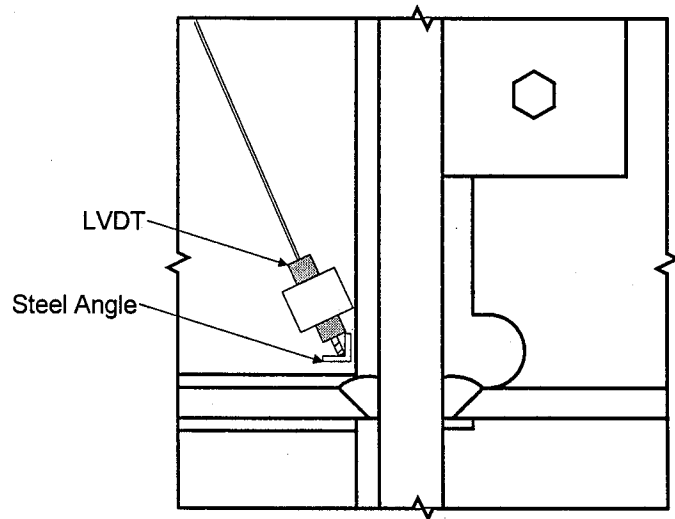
Elevation IV: LVDT Locations of South Connection Region
